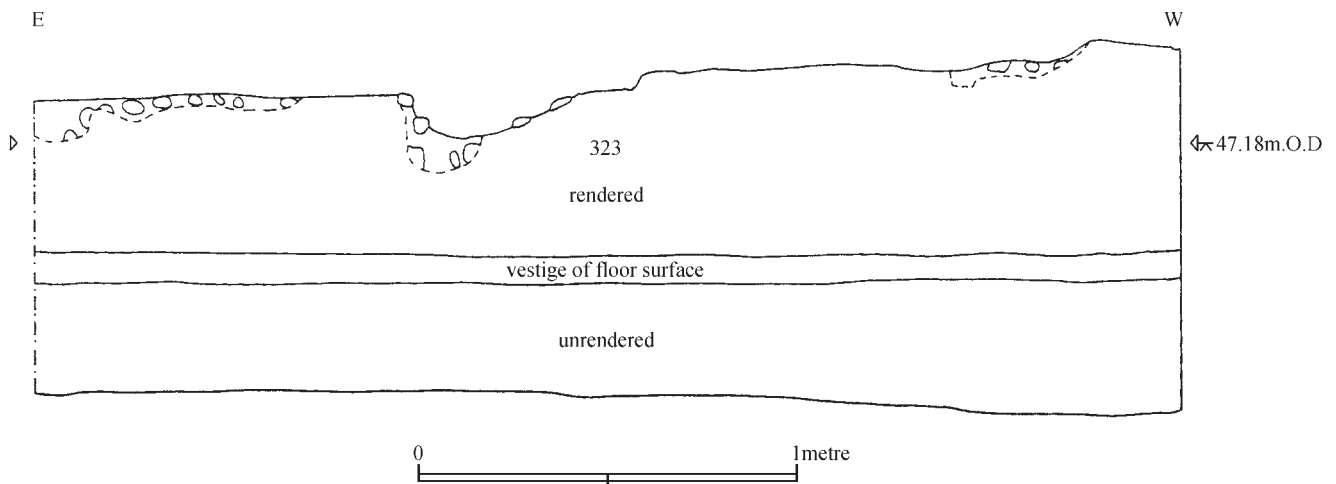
EW section, small rectangular room (wall 323). Scale 1:20
